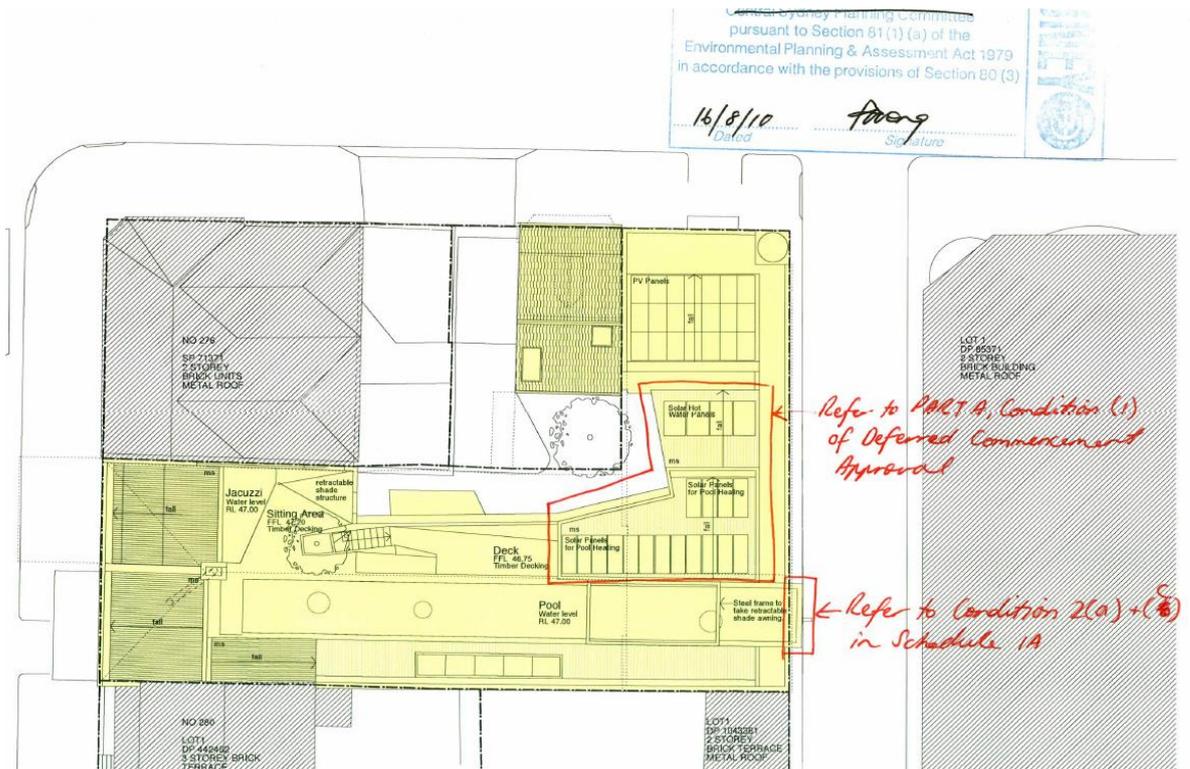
Extract from stamped plans - D/2009/1123 - showing area to be redesigned to minimise overshadowing
